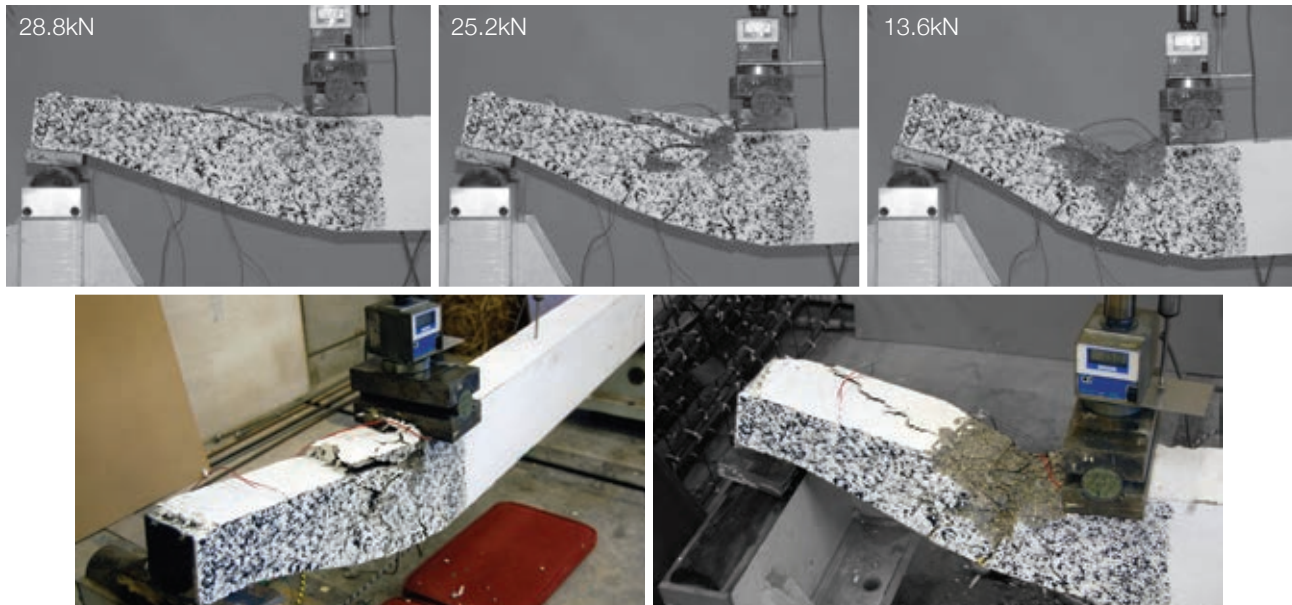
Deformation and spalling in Beam 9\_2\_STM\_2(i) beyond peak load.
